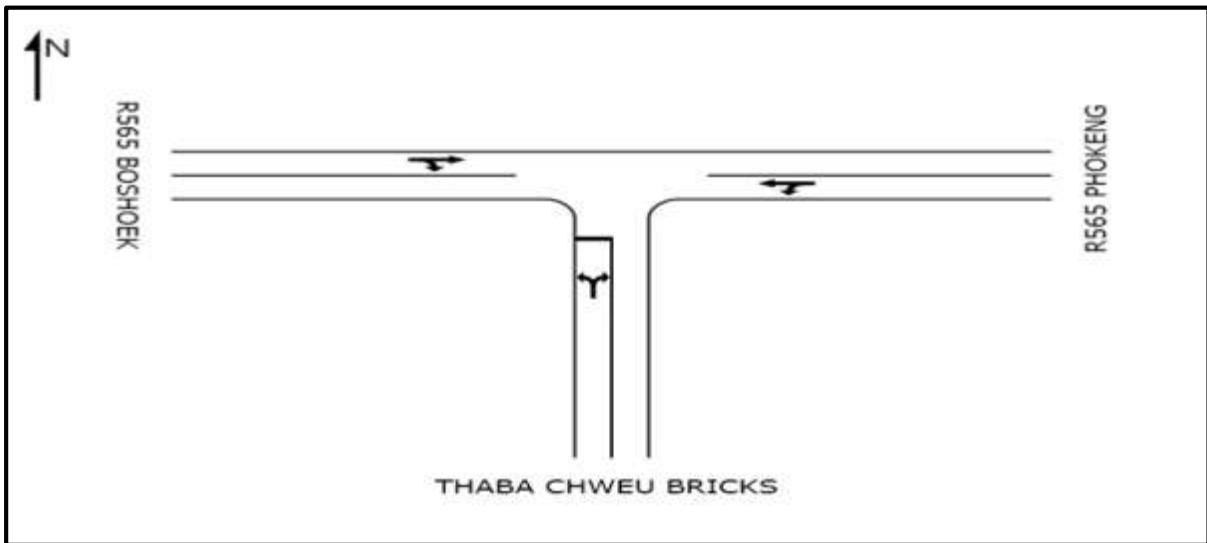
R565 & Unknown Gravel Road Existing intersection B Layout
